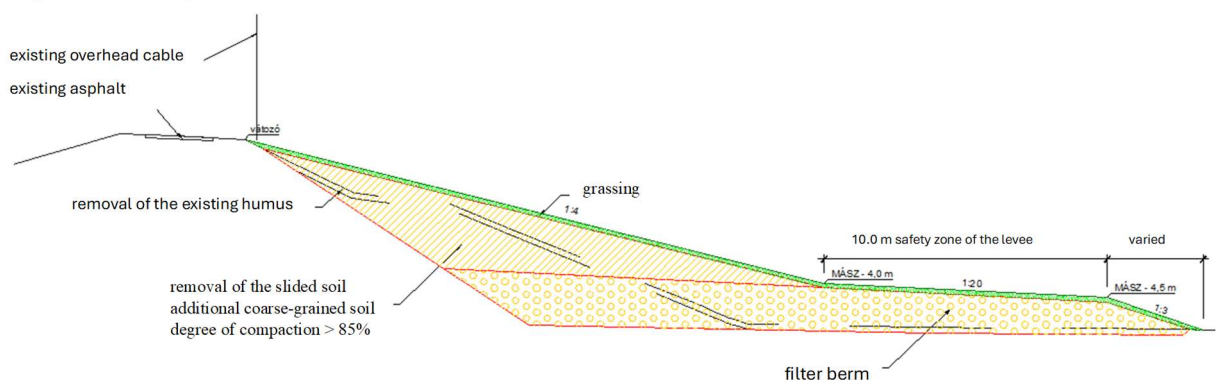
Cross section of the reinforcement containing stabilizing granular soil.
